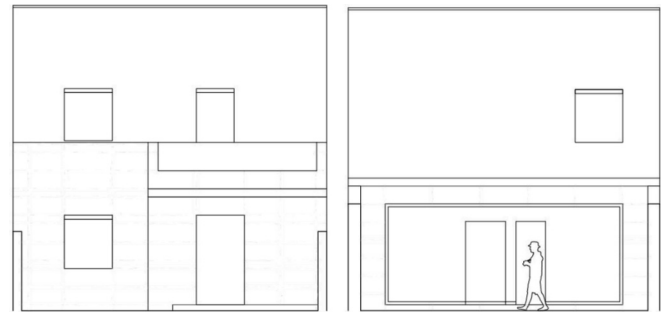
Windows and openings: a) Main façade (NE), b) Rear façade (SW). Source: the authors.
